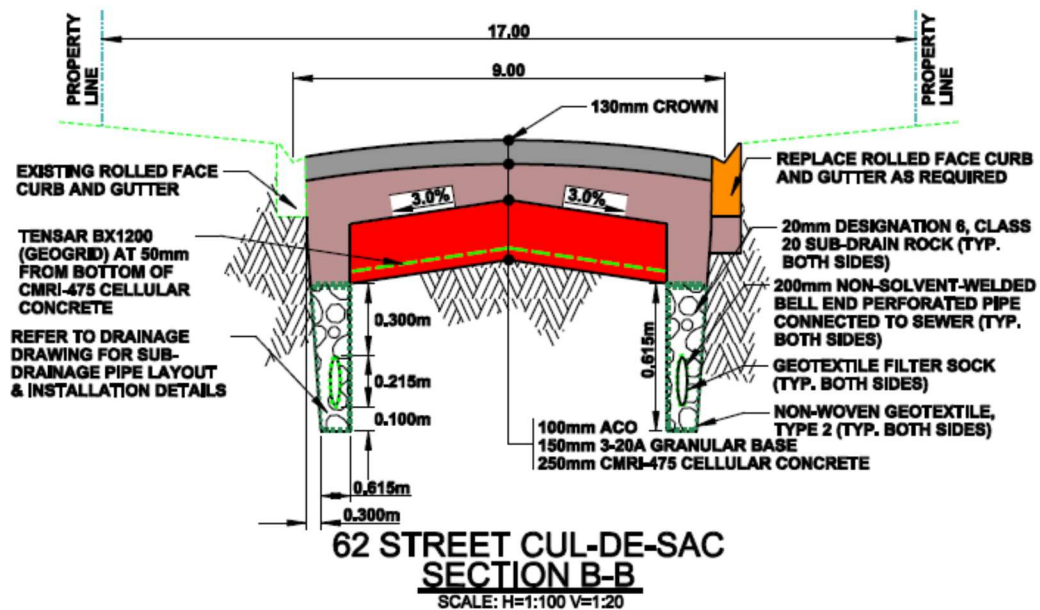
62 Avenue Cellular Concrete Test Section Cross Section
